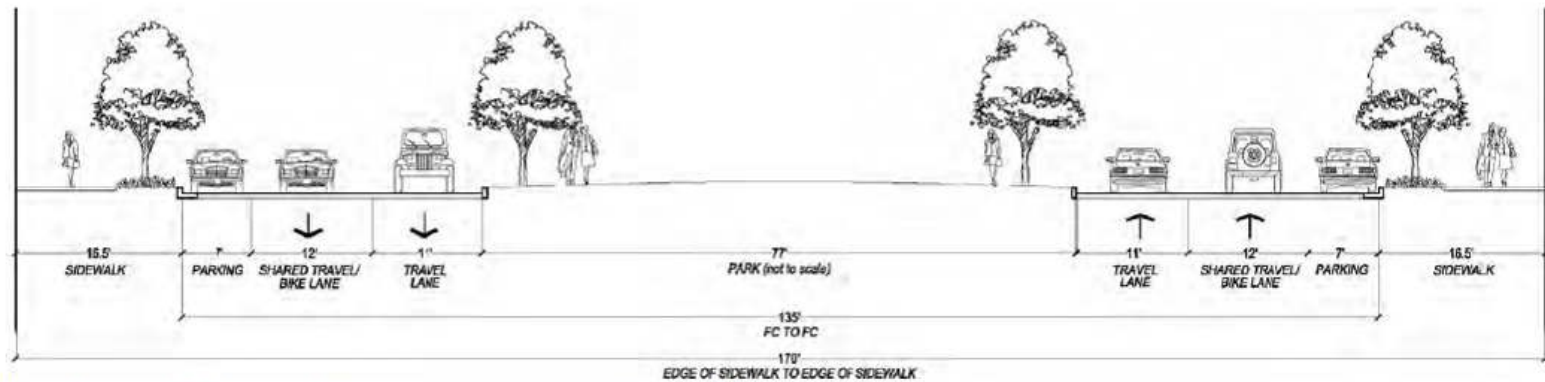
Recommended mid-block cross-section of 15th Street S. looking west between Crystal Drive and S. Clark/Bell Street
